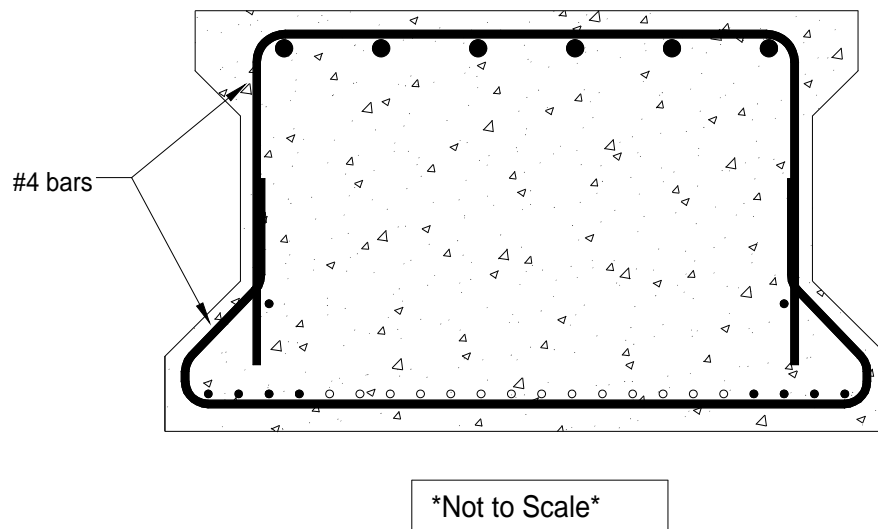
Typical Stirrup Reinforcement in End Diaphragm
